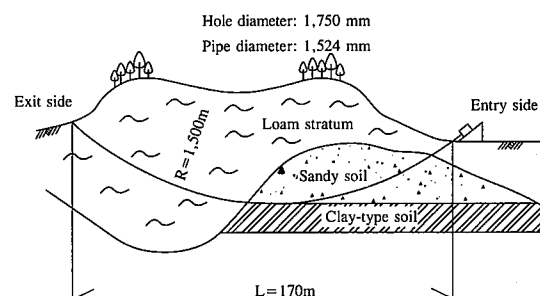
Cross-sectional view of tunnel drilled in field experiment
